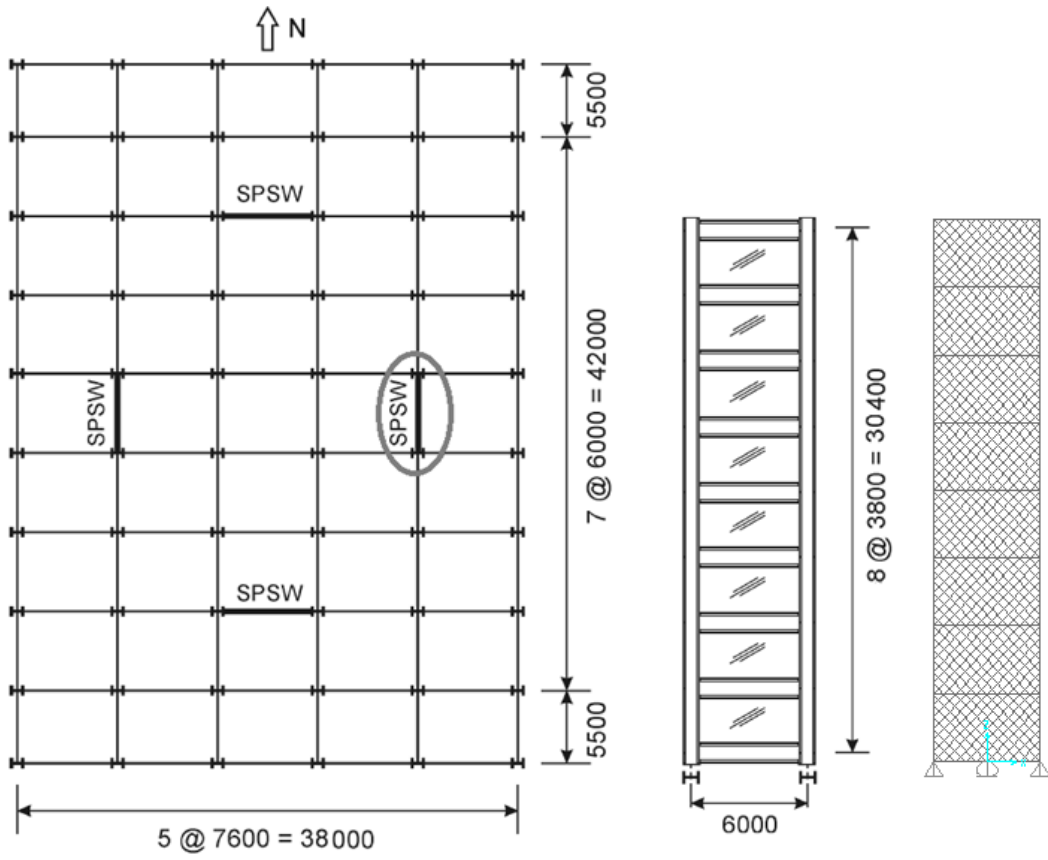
Floor plan, SPSW dimensions and dual strip model
